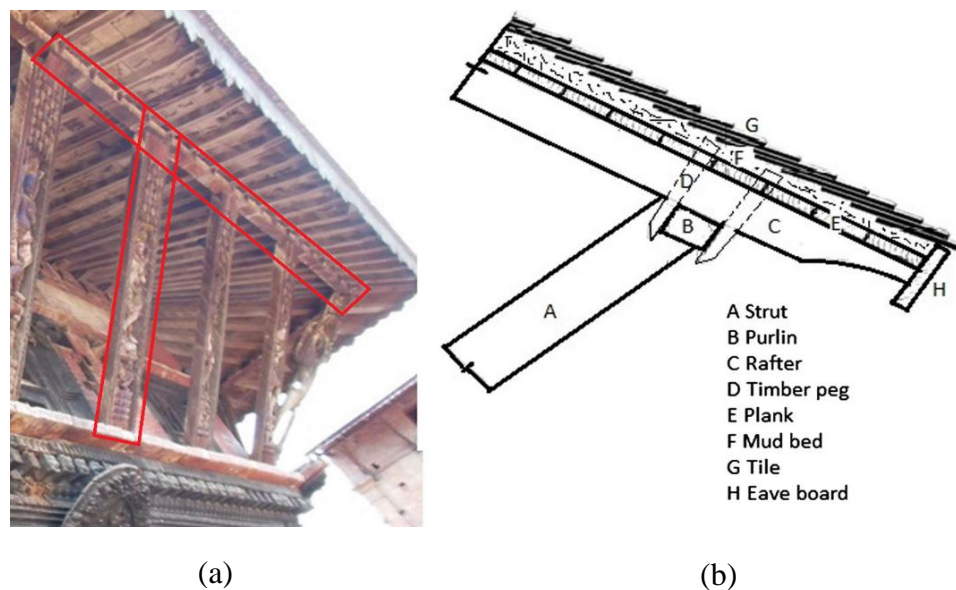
Common traditional timber joinery in Pagoda temples: (a) roof-overhangs held by inclined timber struts and (b) timber peg joint (Shakya et al. 2014).
